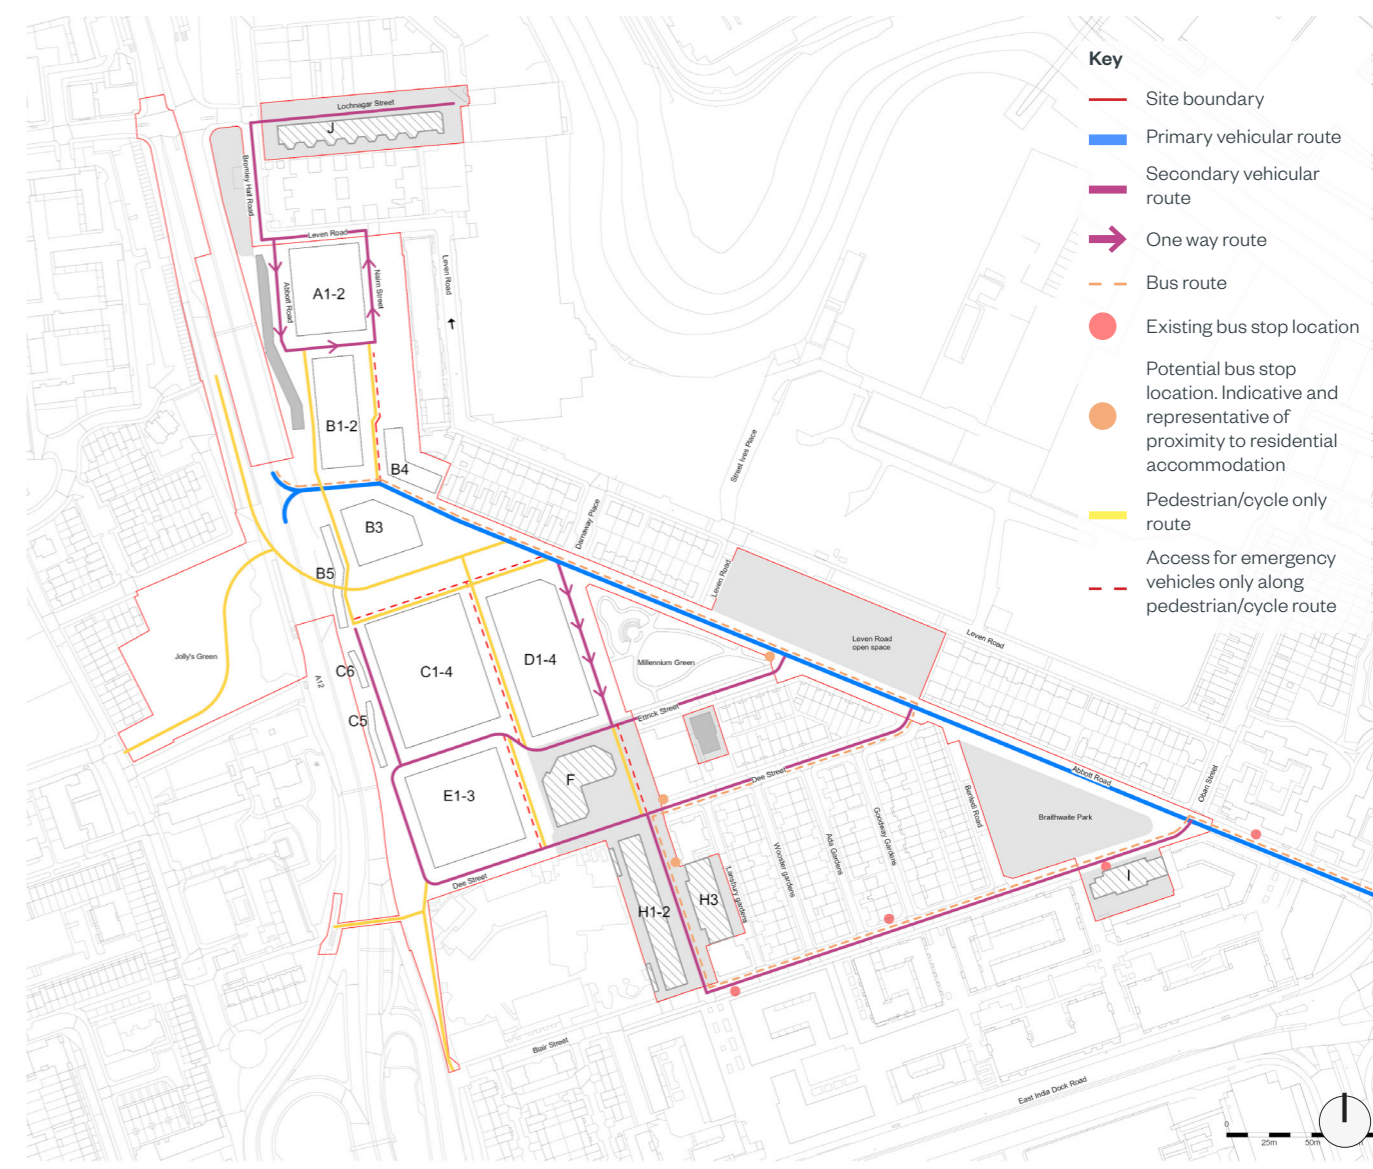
Parameter Plan extract - access and circulation (refer to the submitted Parameter Plans)
